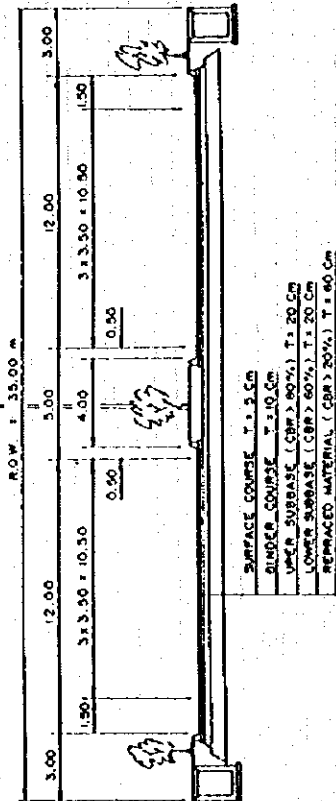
Typical Cross Sections for Route-3 and Route-5
